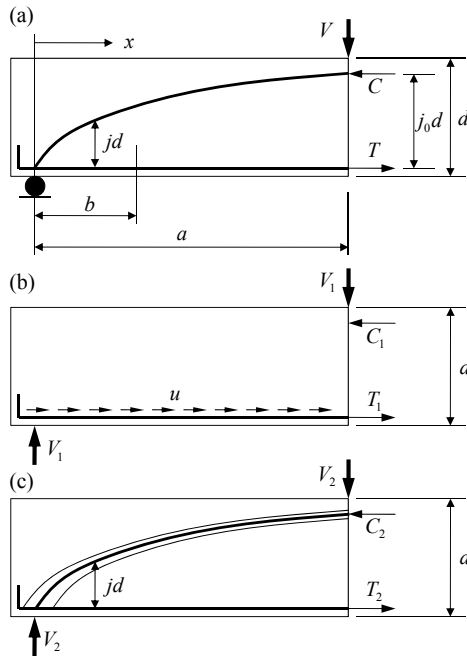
Diagonal shear failure of longitudinal reinforced concrete beam proposed by Bazant and Kim (1984): (a) decomposition of shear loading capacity; (b) composite action; (c) arch action
